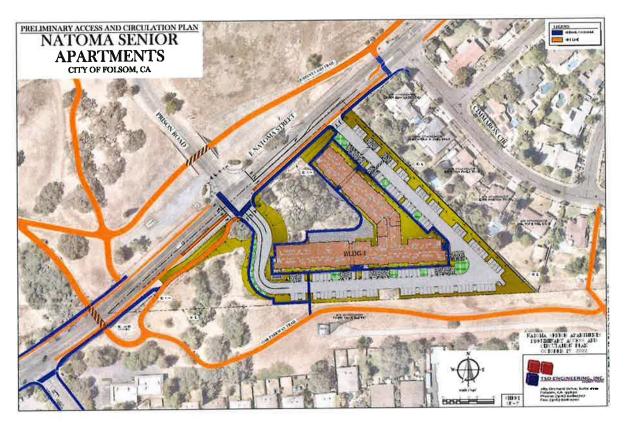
PRELIMINARY ACCESS AND CIRCULATION PLAN
